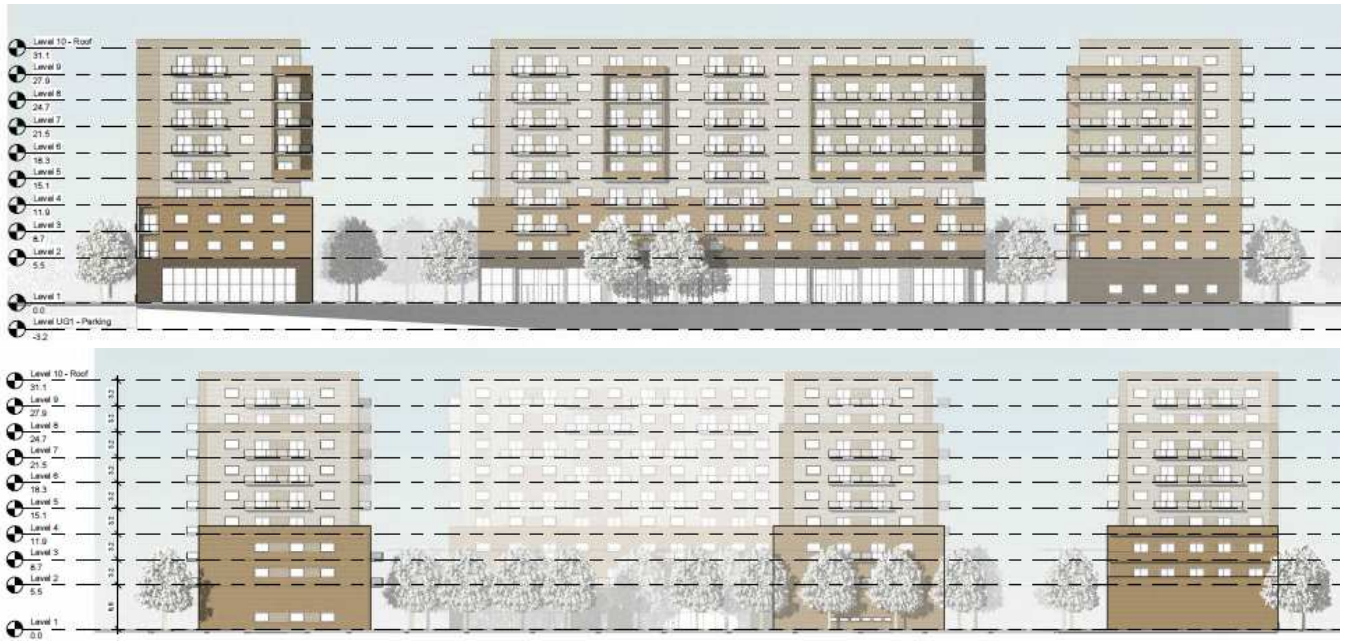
North elevation (top) and South elevation (bottom) of all proposed buildings
